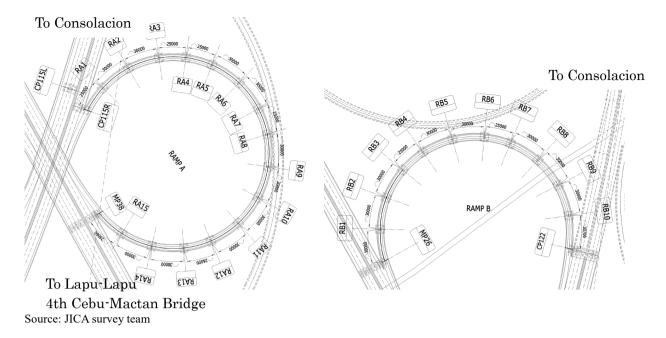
Bridge Span Arrangement of Ramp A and Ramp B
